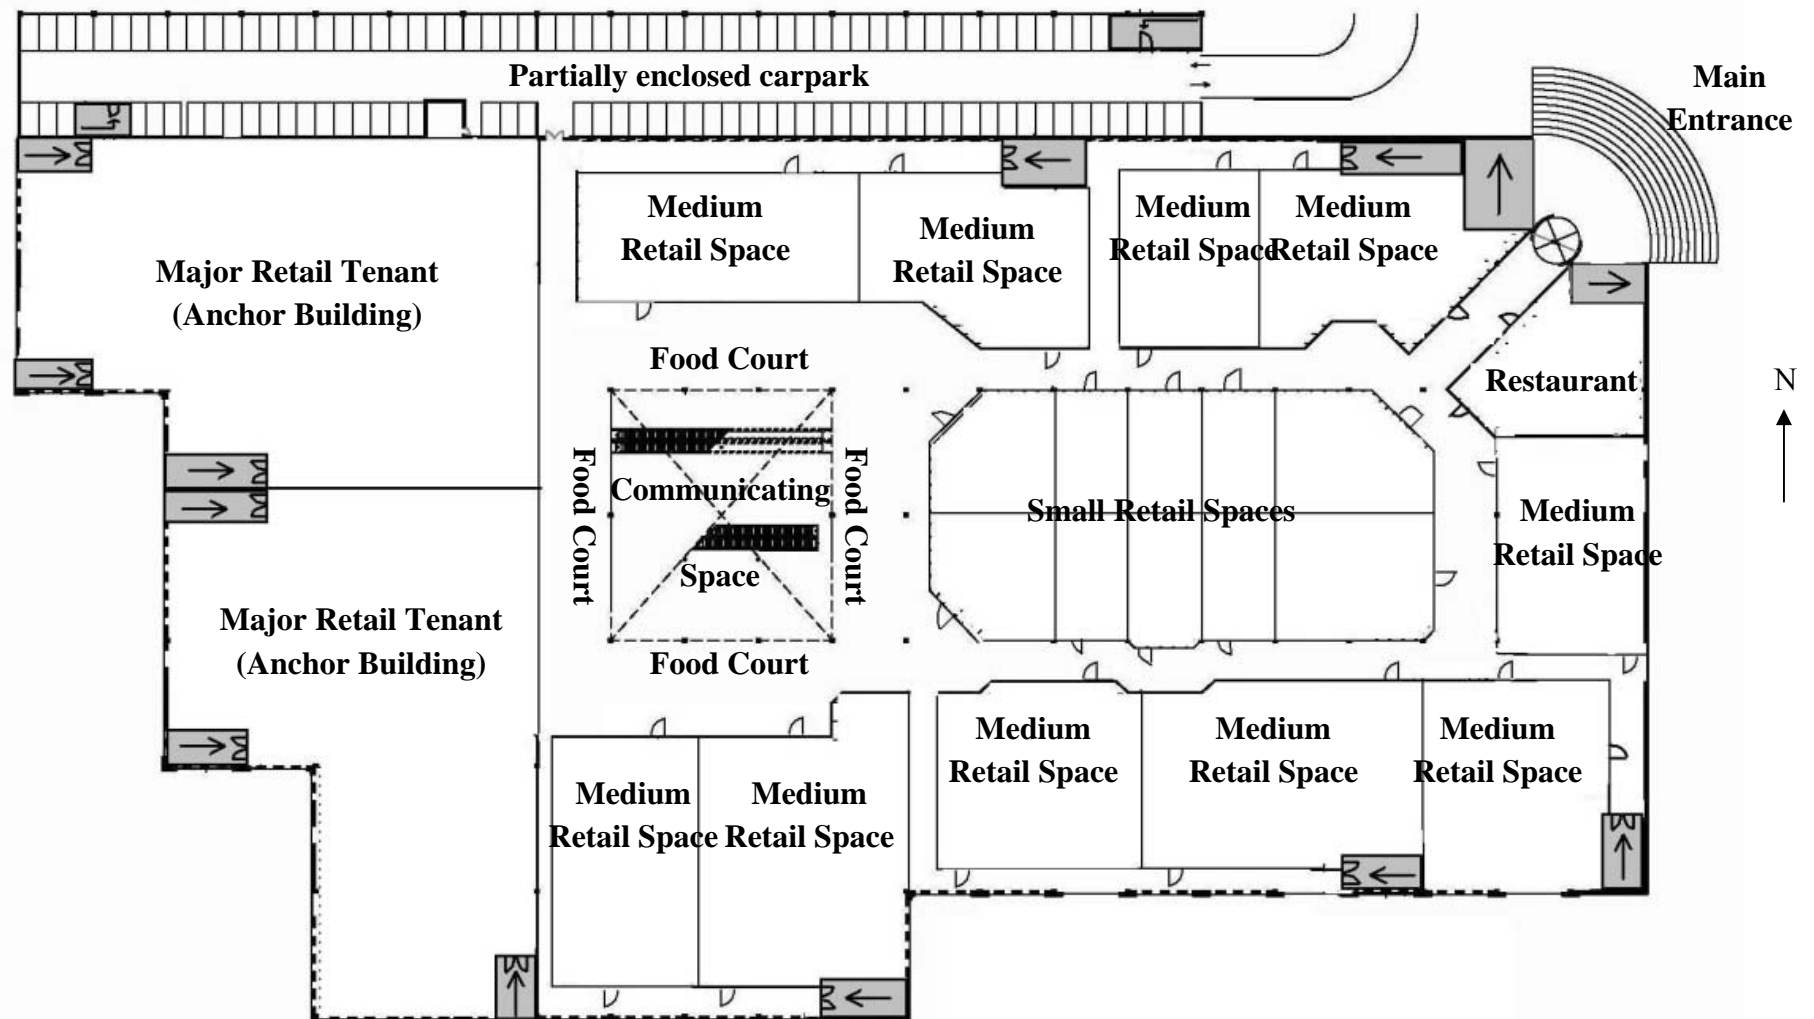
Plan view of floor 2 in shopping mall (not to scale)
